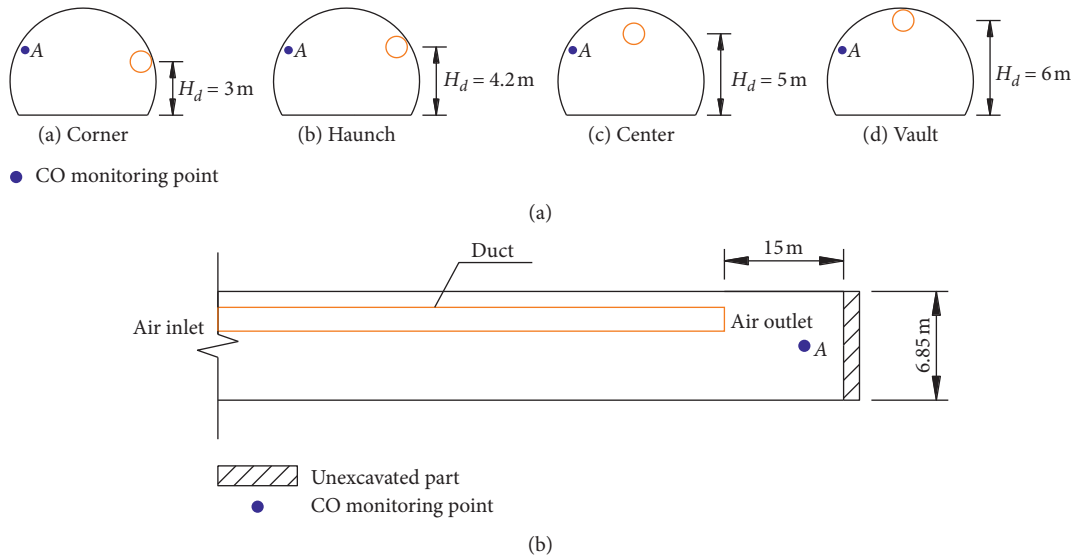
Indication of simulated cross section and longitudinal section for air pipe layout. (a) Cross section. (b) Longitudinal section.
